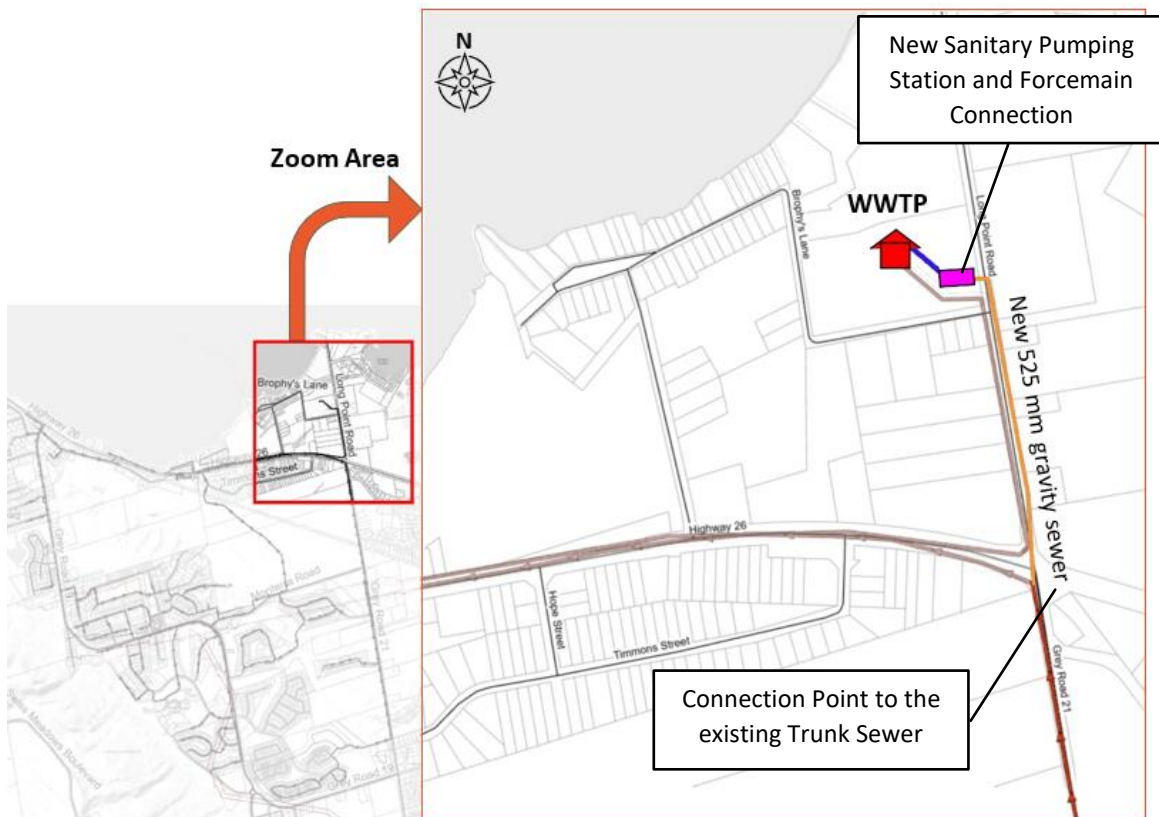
Alternative C – New Sewage Pumping Station on Craigleith WWTP Site
